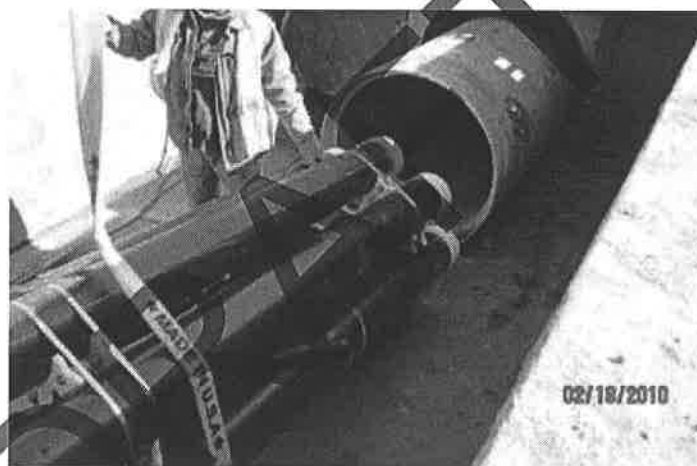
Typical Jack and Bore Conduit and Casing Arrangement
